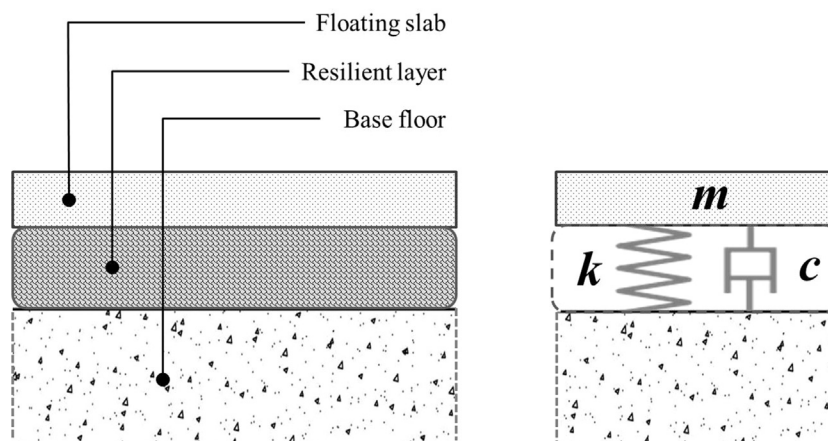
Section of a floating floor built on a concrete base floor and the mechanical model, in which resilient layer is defined by its stiffness (spring of elastic constant k) and damping (dampener of dissipative constant c) and the floating slab by its inertia (mass m).
